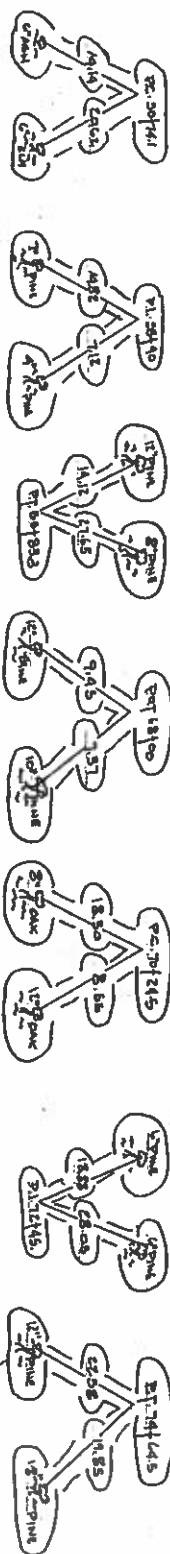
PLAN - PROFILE - GALLATIN ROAD
